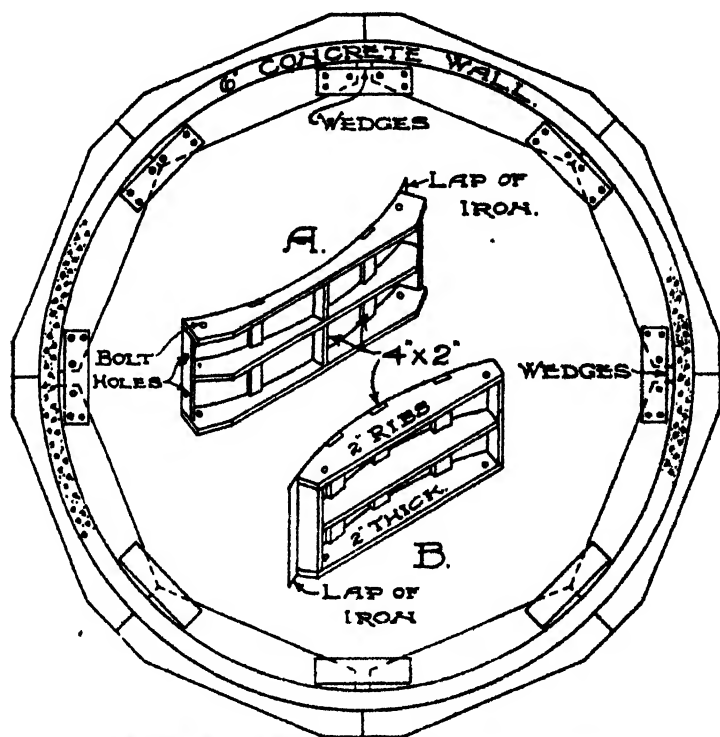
Plan of Circular Concrete Silo, showing Forms.
